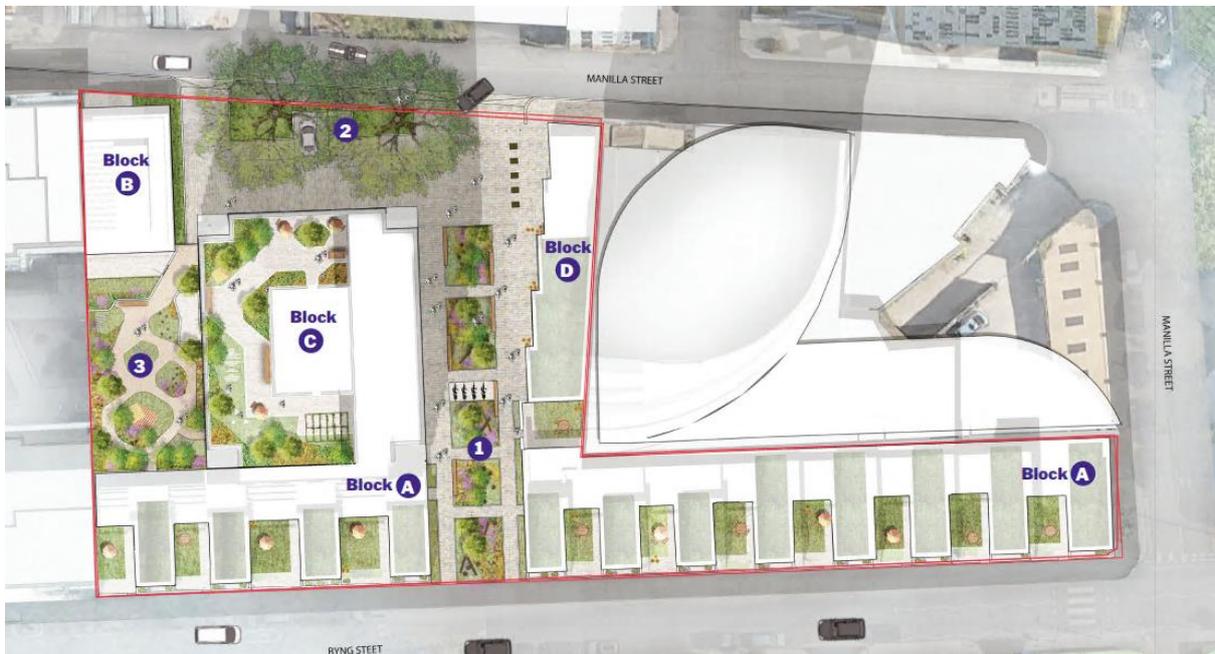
Original scheme PA/20/01065/A1 approved site layout.
